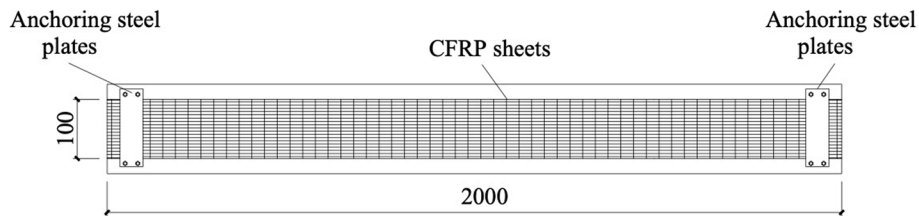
Layout of the prestressed CFRP sheets under mechanical tensioning test (unit in mm)
